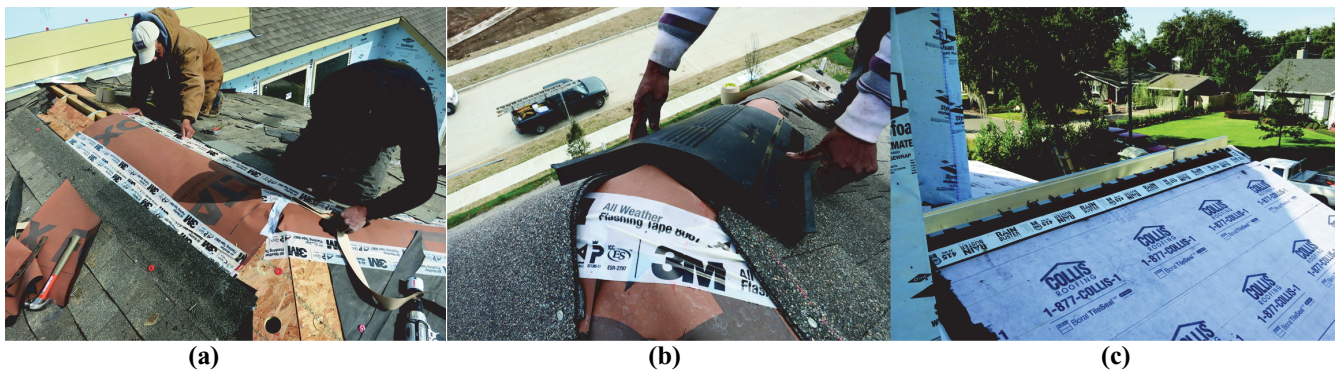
Diffusion vent details (left to right): Houston asphalt shingle diffusion vent ridge detail; Houston hip detail with ridge vent; Orlando tile roof ridge detail, with ridge metal tile support.
